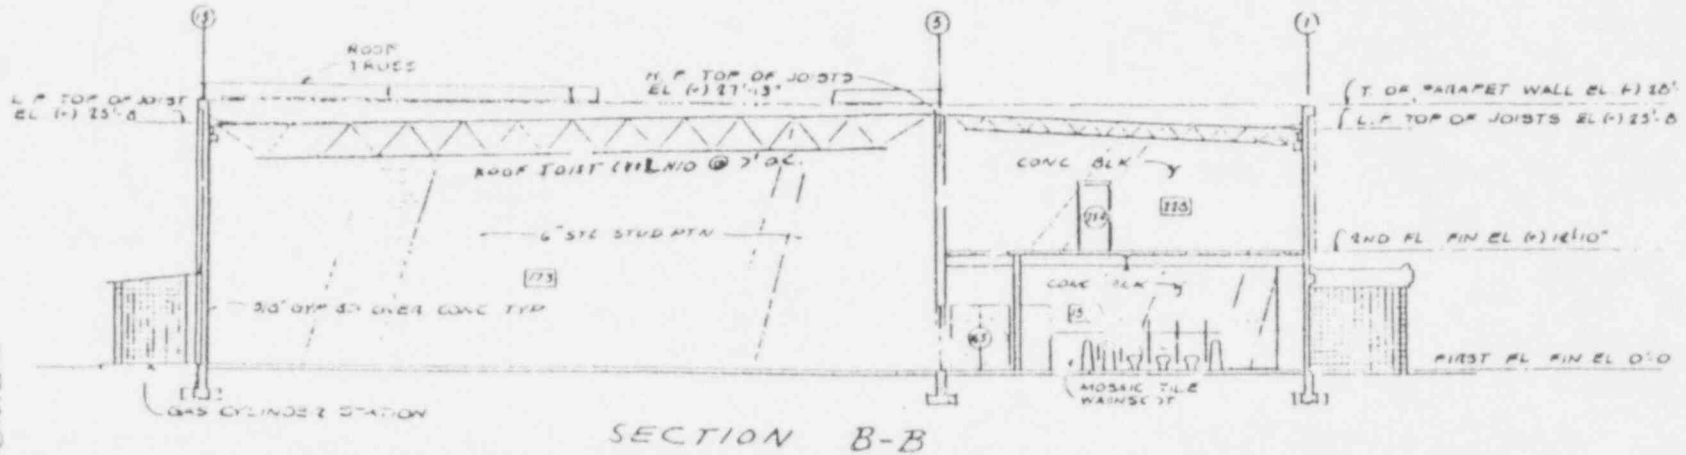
(b) BUILDING SECTION (NORTH-SOUTH)
